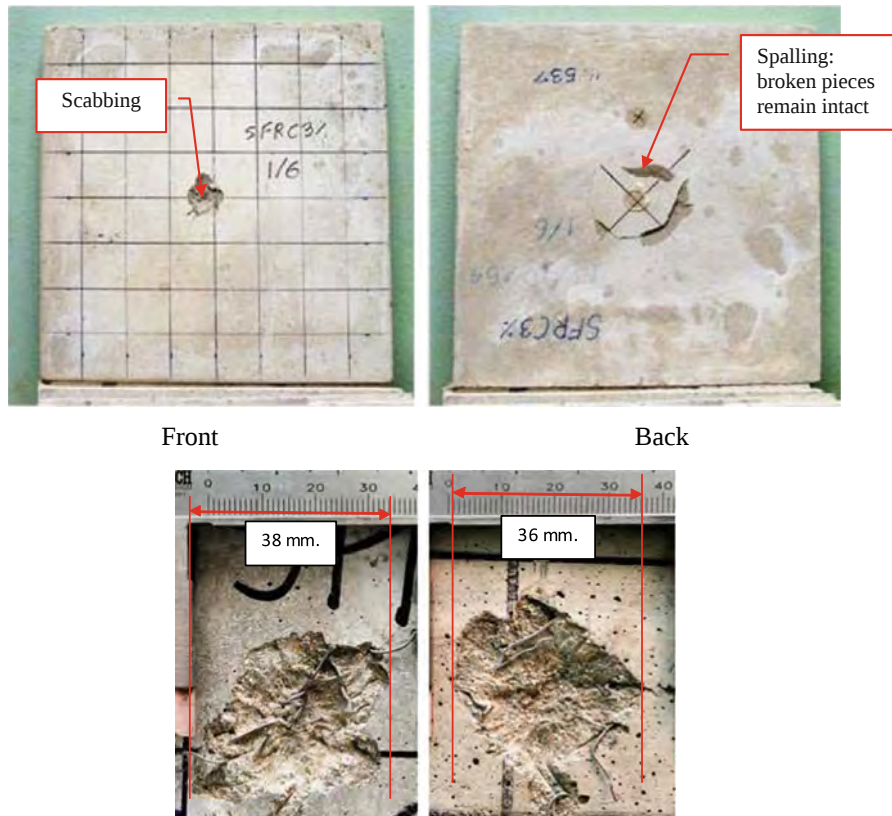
Failure patterns of single layer SFRC concrete panel
